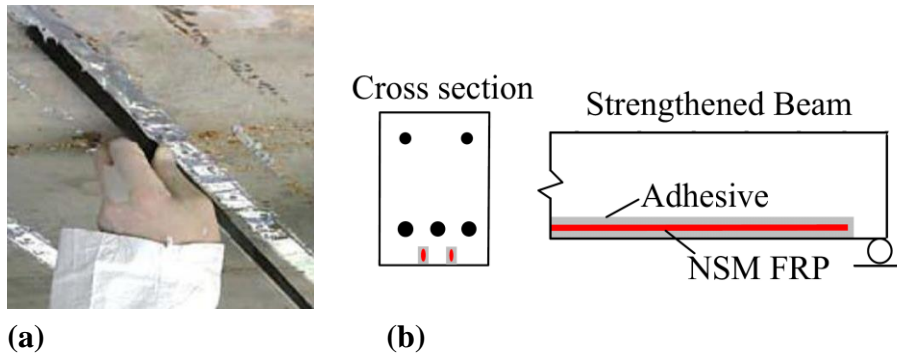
NSM strengthening system: (a) typical application for flexural strength of an RC structure (adapted from [14]) and (b) laminates positioning scheme in the beam's sections [25]
